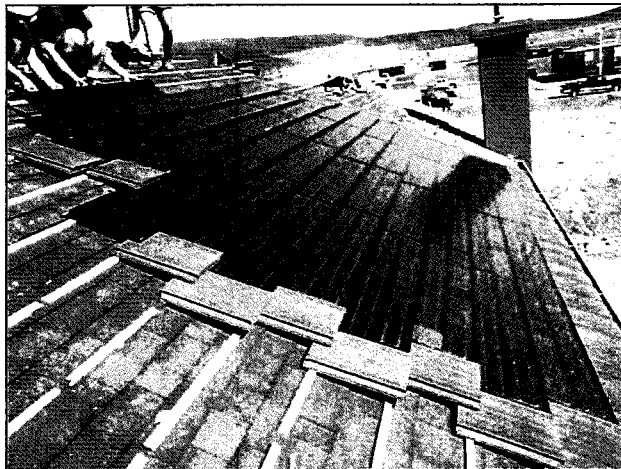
Example of PV Roof Panels Shaped Like Conventional Roofing Shingles
